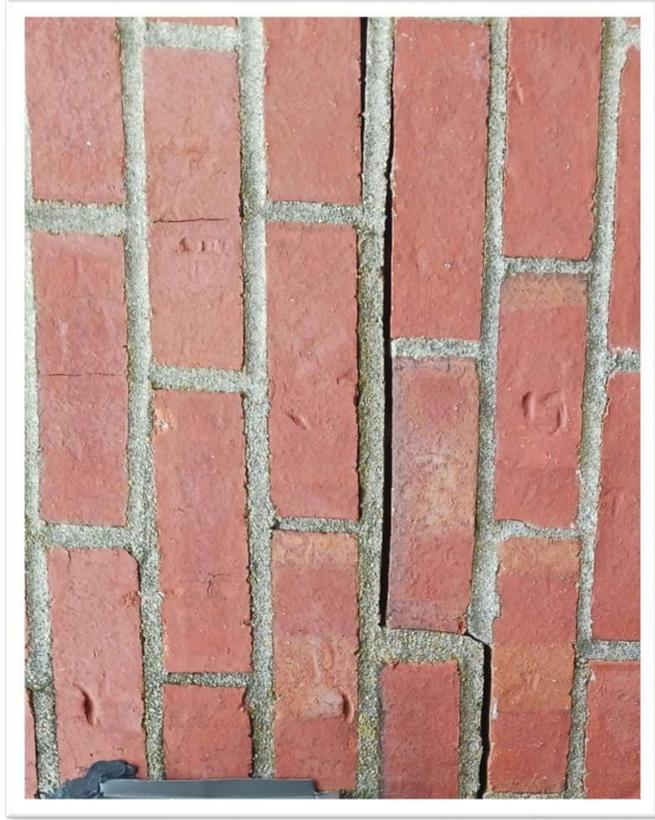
Known as "jaxing" when steel forms rust and expands up to six times its volume, it can cause subsequent and damage to surrounding brick masonry.
